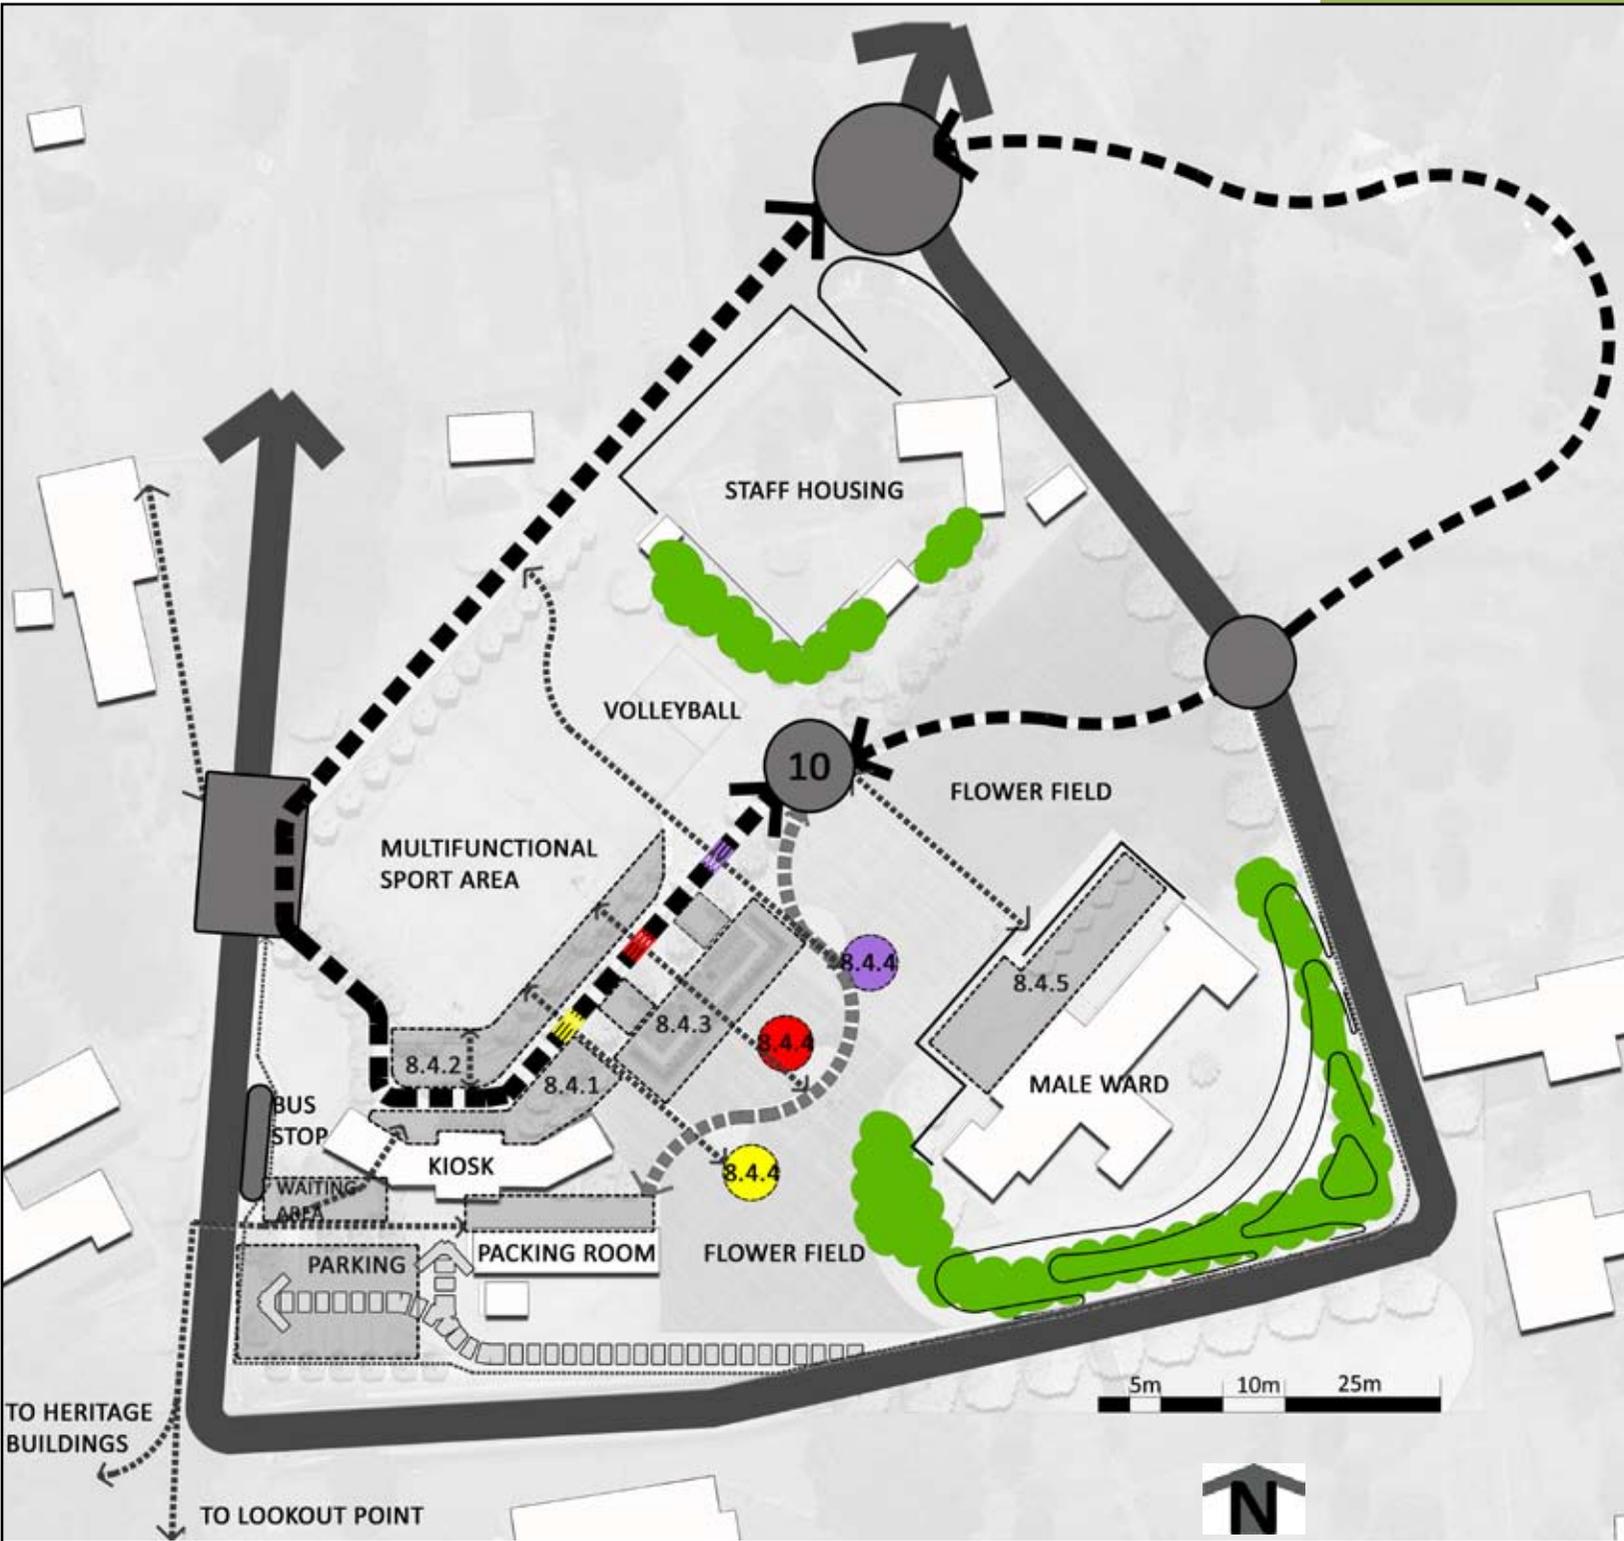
A graphic illustration of the sketch plan showing the application of the structuring elements in 8.3 and the experiences and spaces that will be discussed in 8.4 (Author, 2009).
